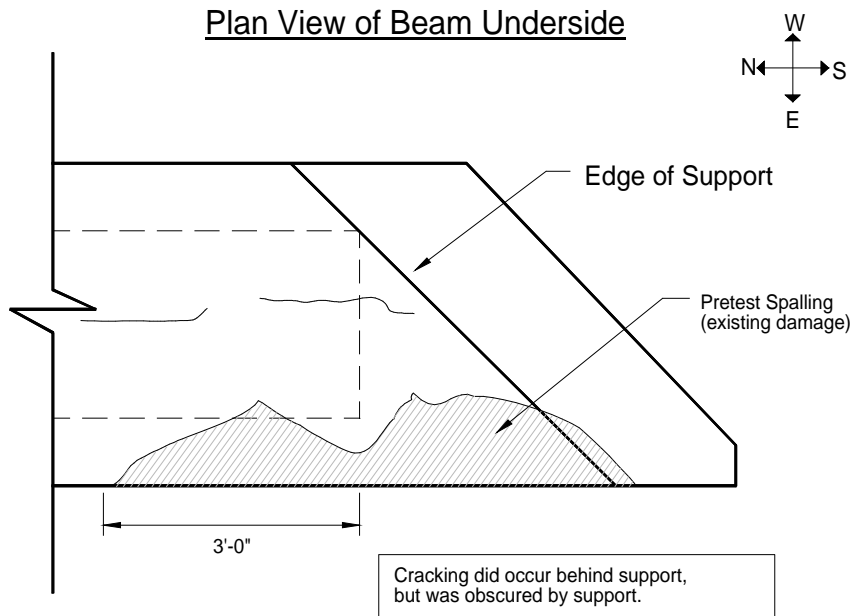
Pretest Cracking in Bottom Flange of Box Beam 5 - Test 2
